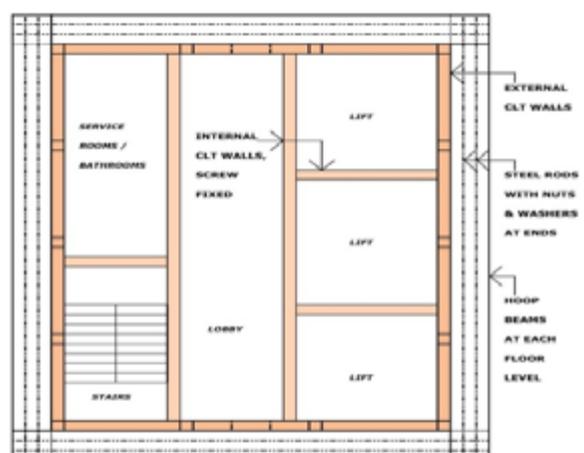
Plan of internal walls and architectural functions of the integrated panel core. Timber hoop beams are shown including the internal steel rods
